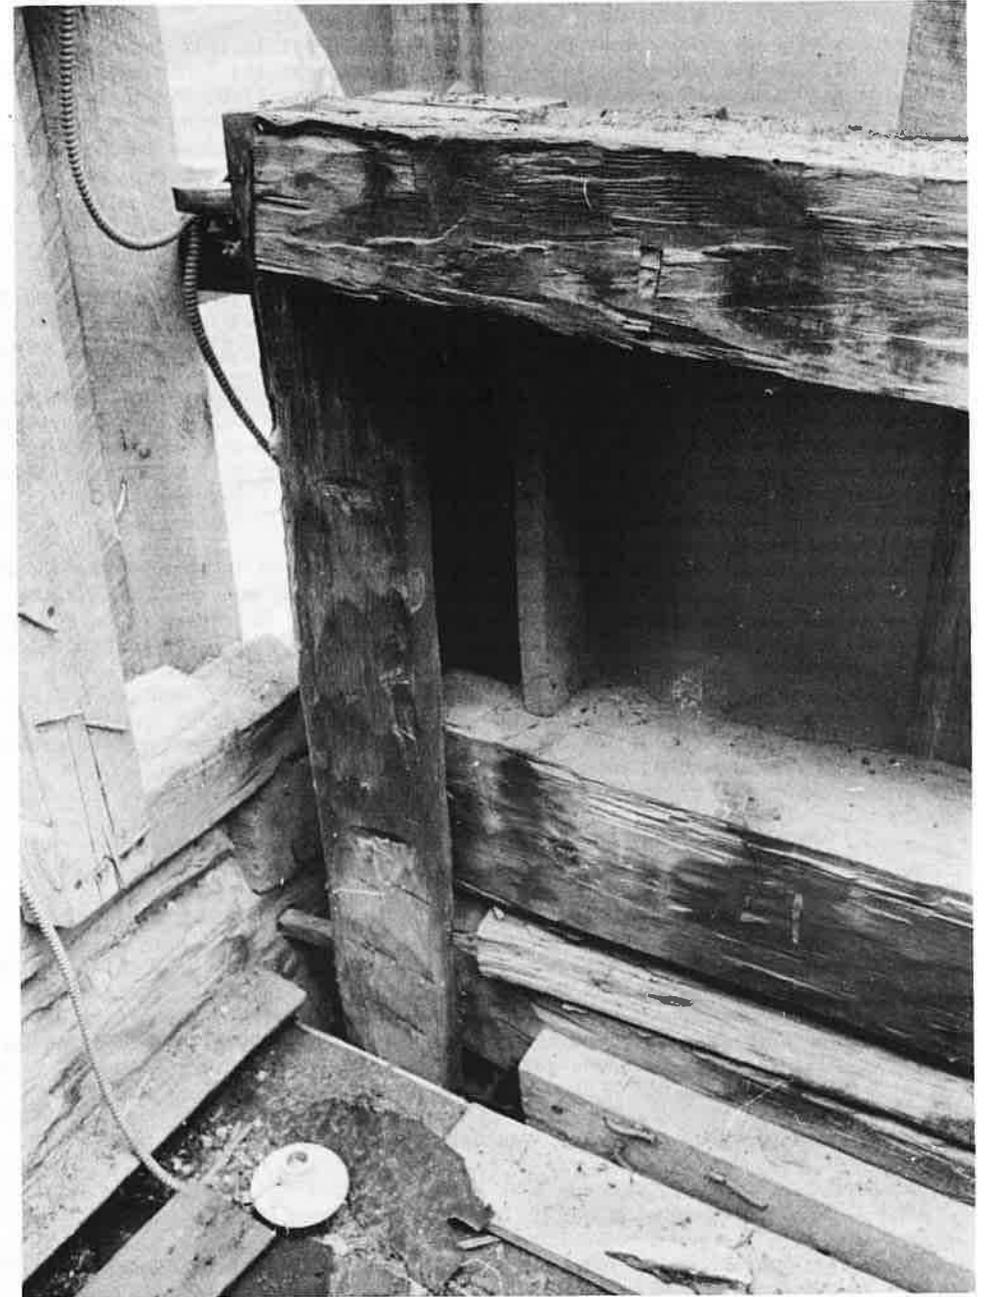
Detail of vertical post at plate, *pièce sur pièce*. Note peg holding post to other pen wall. Same structure as FIGURE 5.
